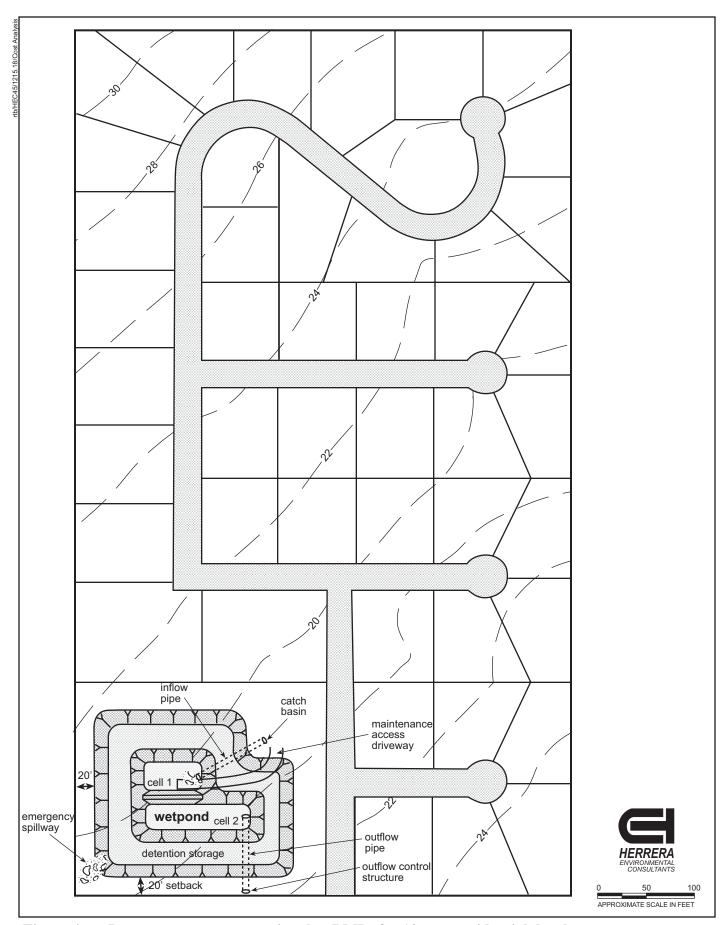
Permanent stormwater site plan BMPs for 10-acre residential development without infiltration.
